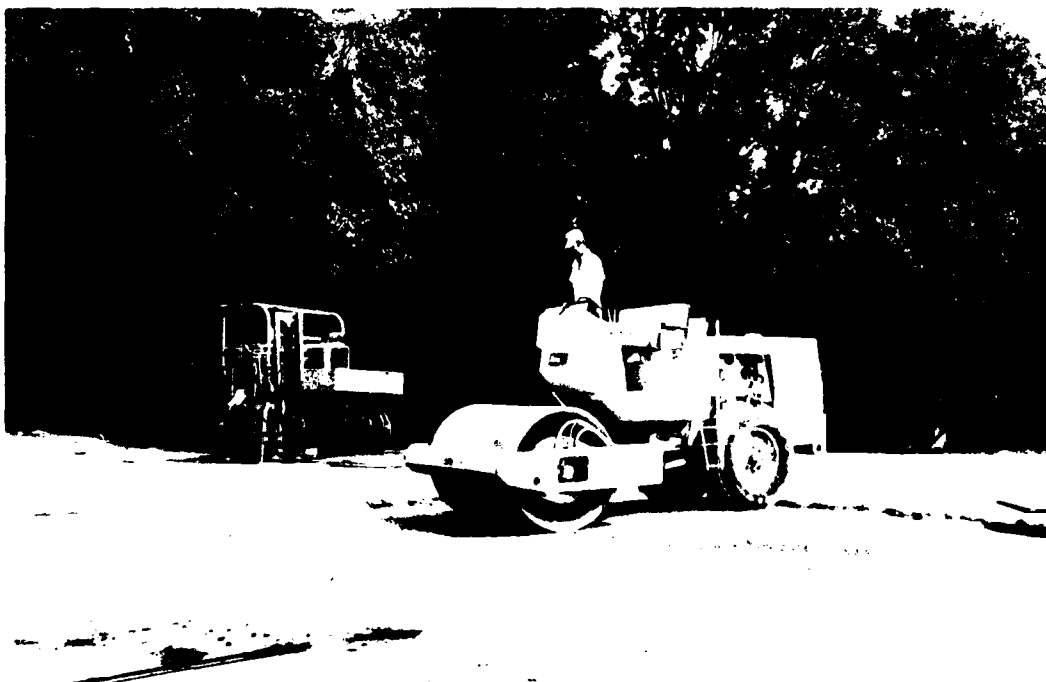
Rolling of the first lift with a vibratory steel-wheel roller in crater 6
